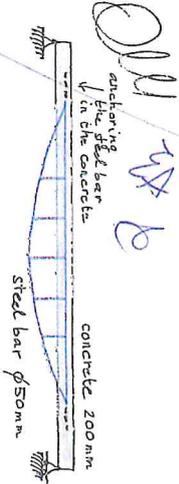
Prefabricated steel bar element (color blue) for C500 roof.
